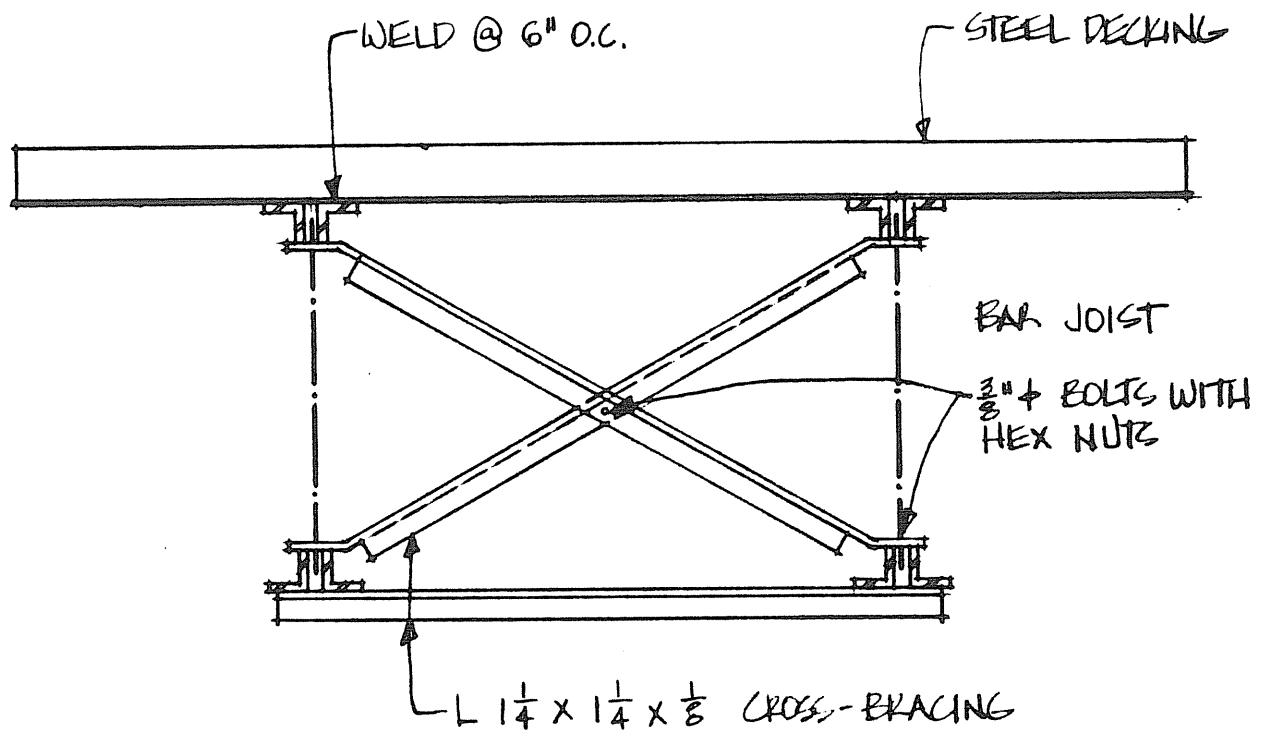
Bar Joist Test Assembly Cross-Bracing
